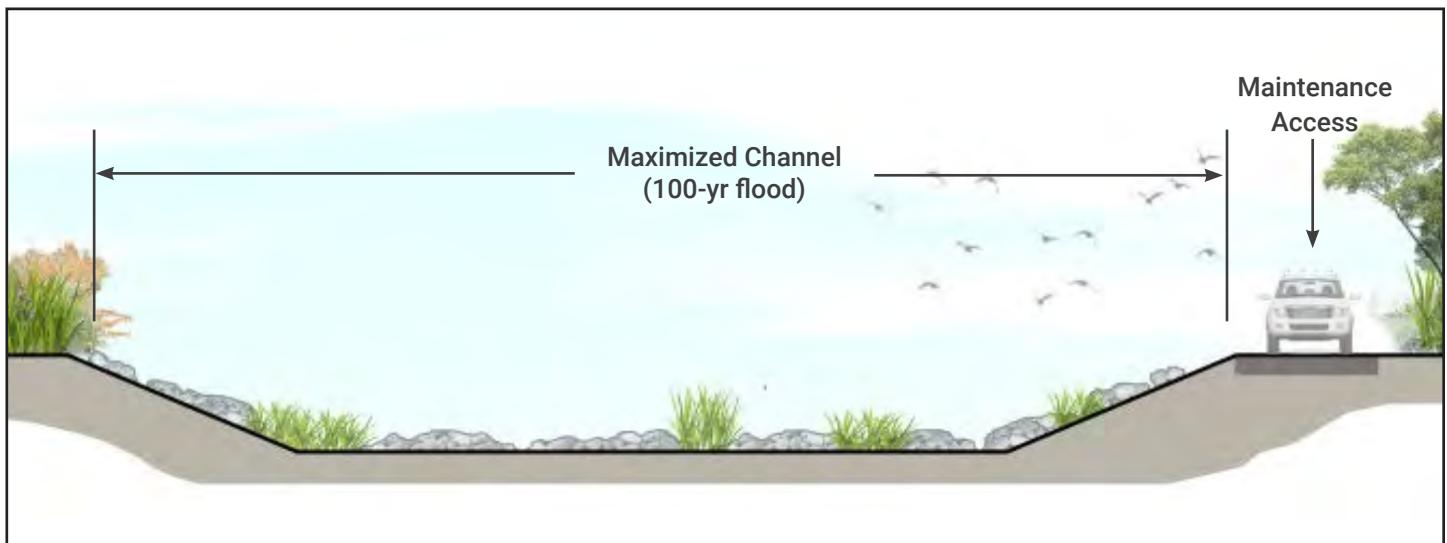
CHANNEL SECTION WITHOUT WALL
